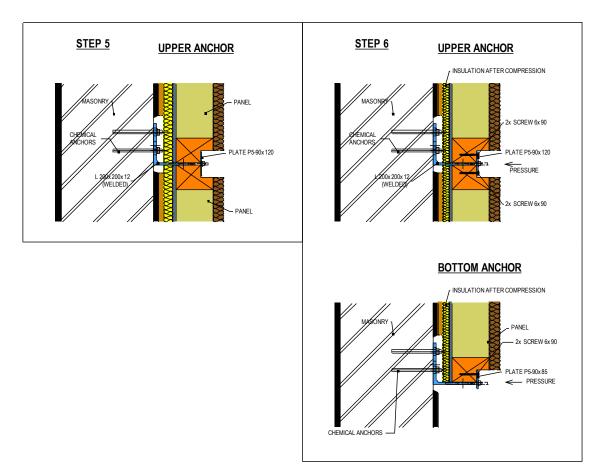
STEPS FOR PANELS INSTALLATION AND ANCHOR TIGHTENING
